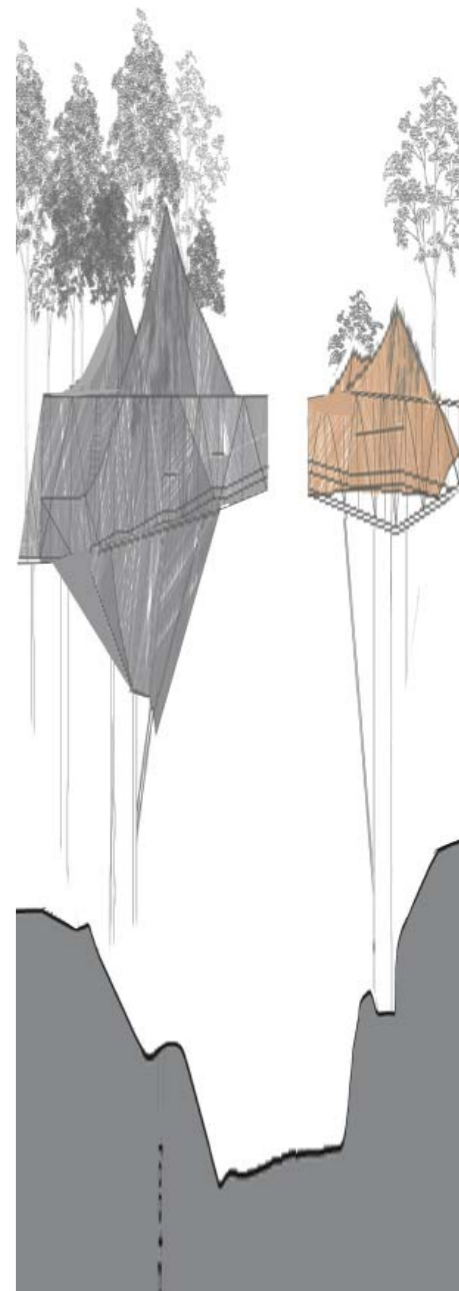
& 110: Warburton Trail Bridge; compressed plan & section for *Abundant* exhibition format.
